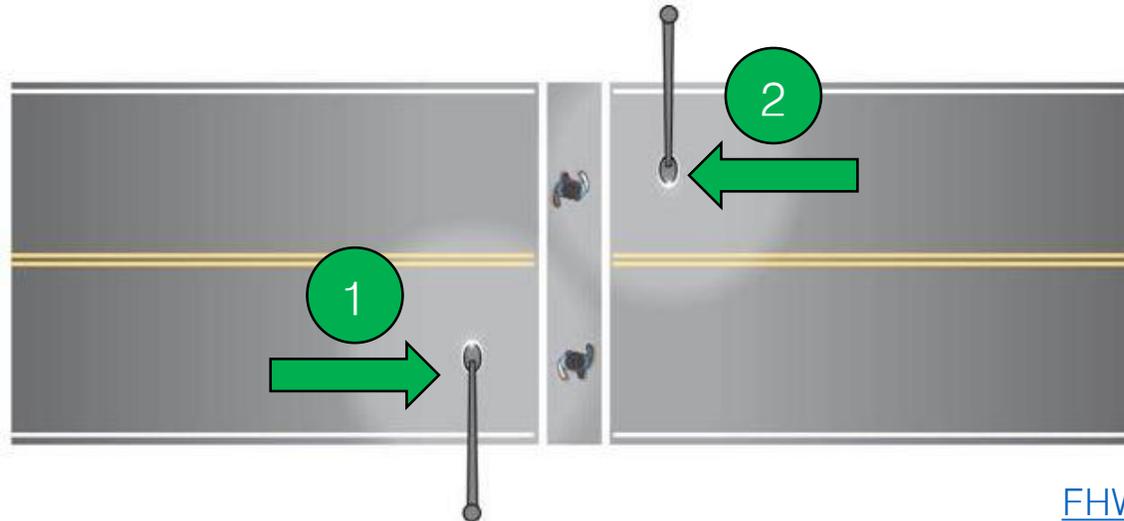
Drawing. New design for midblock crosswalk lighting layout.
